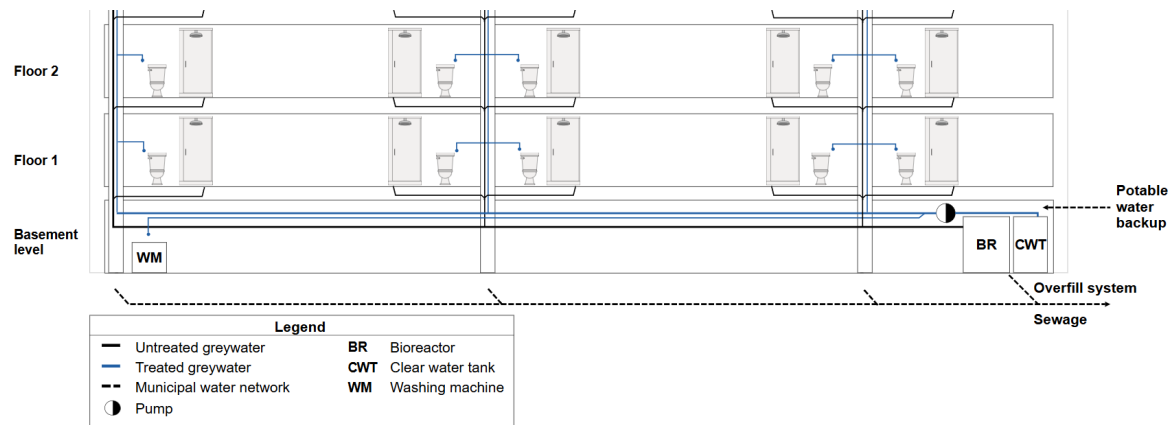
Schematic illustration of the cross-section of the reference building showing the pipe layout for the GRWS. Note that only three shafts are visible, as the remaining two are located behind the visible section.
